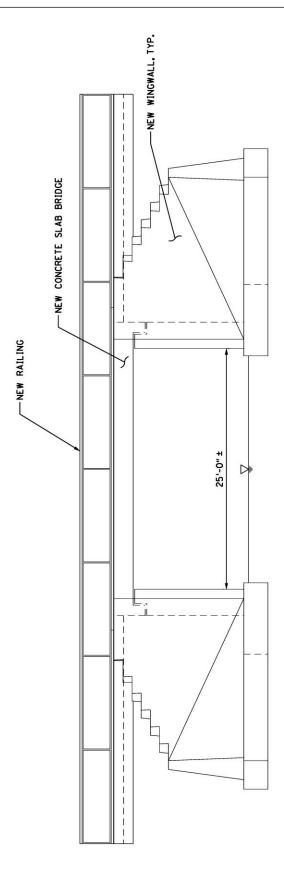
OPTION 4 ELEVATION DRAIN PIPES ON EAST SIDE OF BRIDGE TO BE REWORKED
